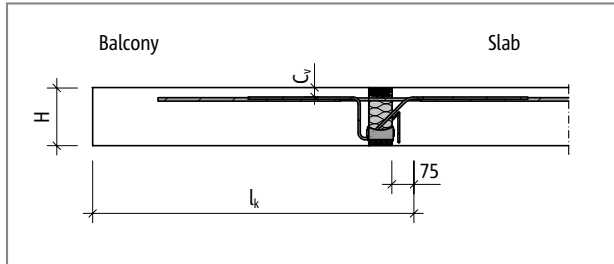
Schöck Isokorb® T type K-E, K-T: Static system, cross-section
